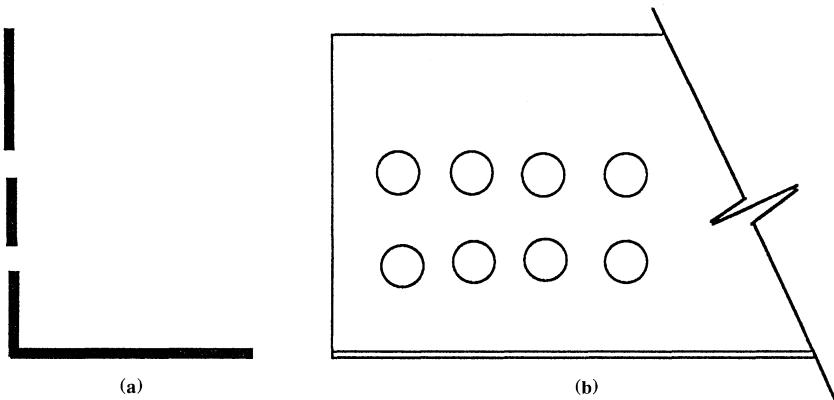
Multiple-bolt connection. (a) Cross section. (b) Side view.
